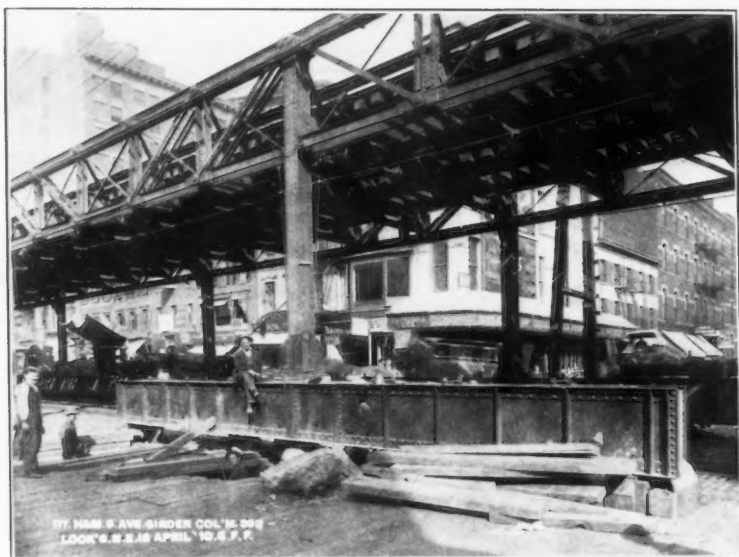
COLUMNS OF ELEVATED RAILROAD SUPPORTED ON 36-INCH GIRDERS.
